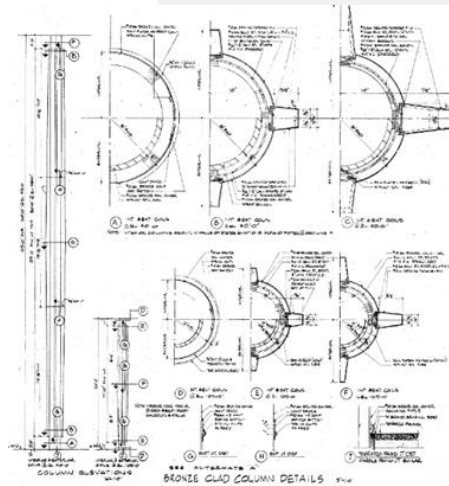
Original drawing details showing "bronze-clad" circular structural steel columns¹¹.
